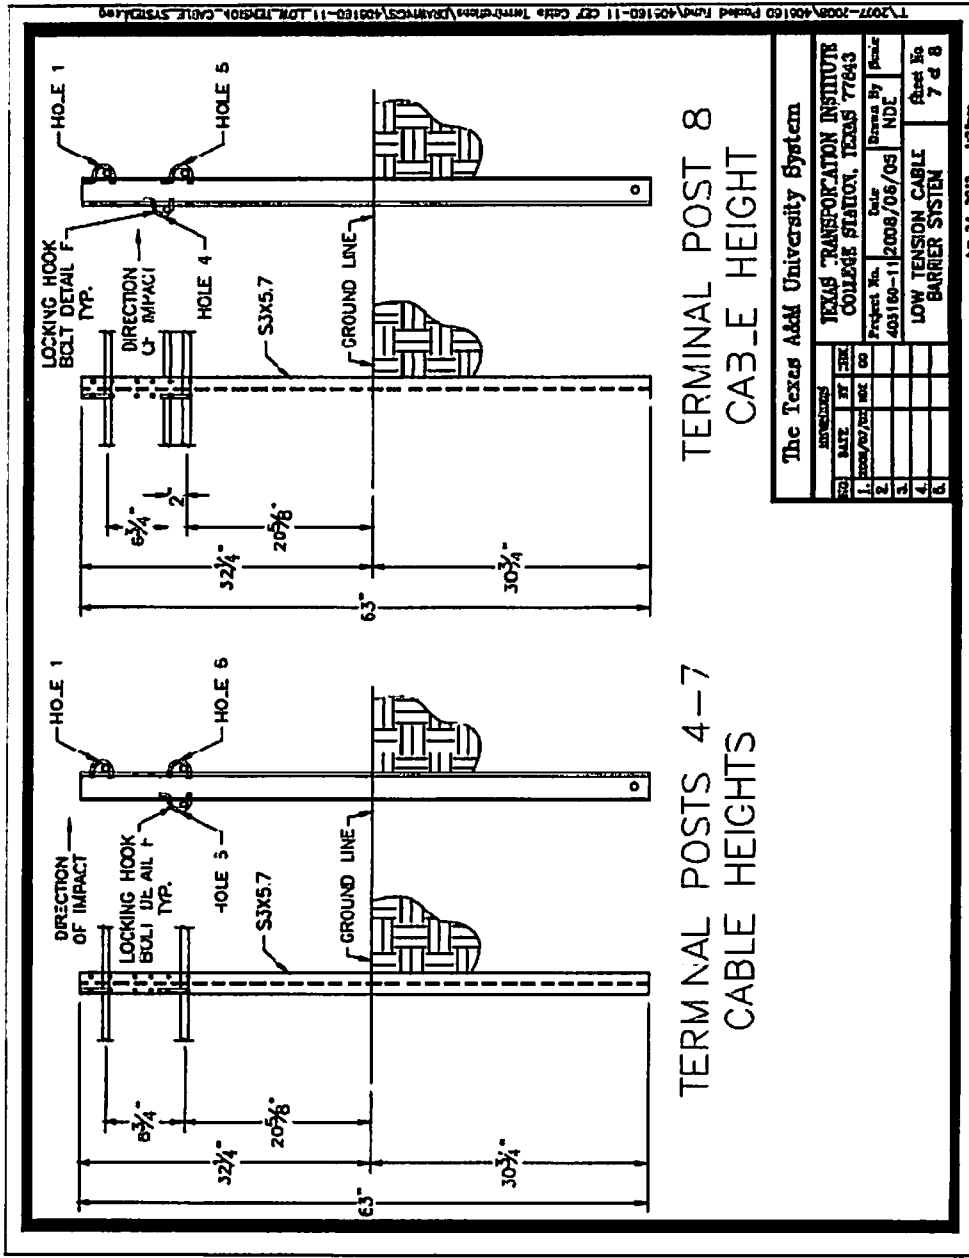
Details of retrofitted low-tension wire rope barrier system – terminal post wire rope heights.
